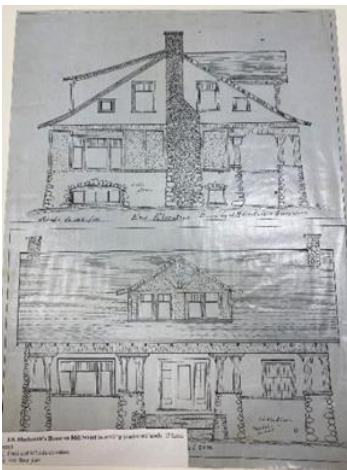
Elevation Drawings for The Birches, 75 Mill Street (EHS ARCHIVES MG12 C6 #44)
